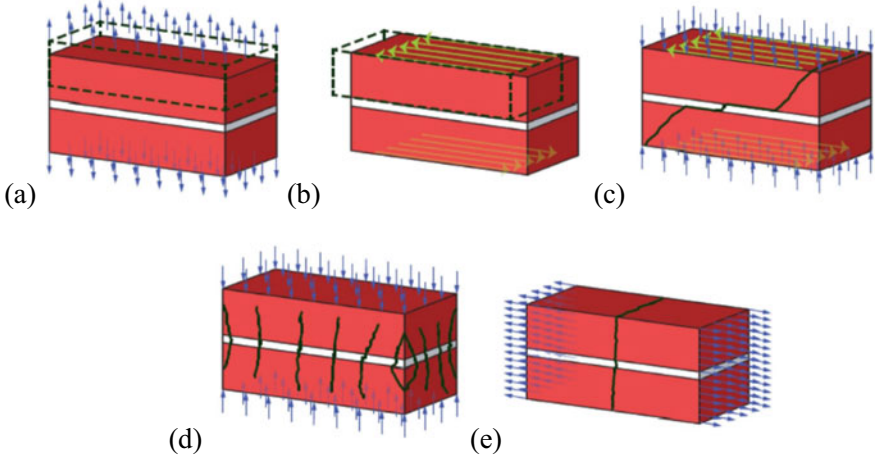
Masonry failure [20]: a bond tensile failure, b bond shear sliding, c diagonal masonry cracking, d masonry crushing, and e tensile cracking
